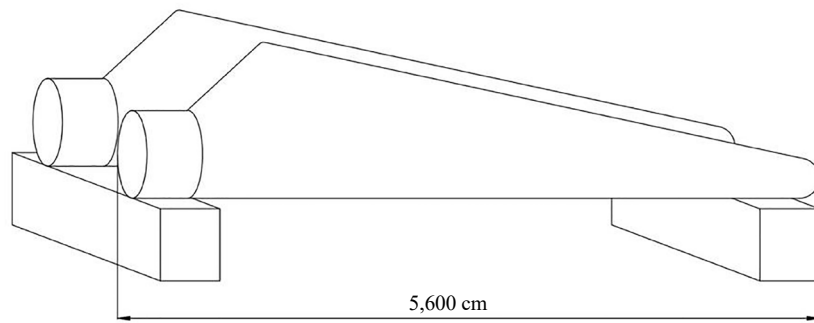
Proposed pedestrian bridge from Blades Upcycling (measurement in cm)
